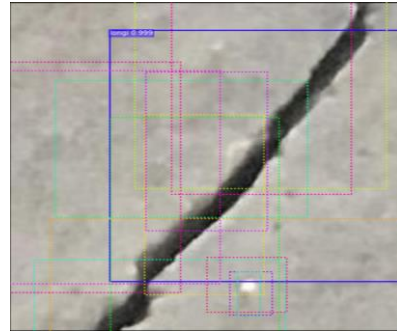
Example in process of detection indicated anchor scale was insufficient to provide anchor boxes for shrouding crack in image
